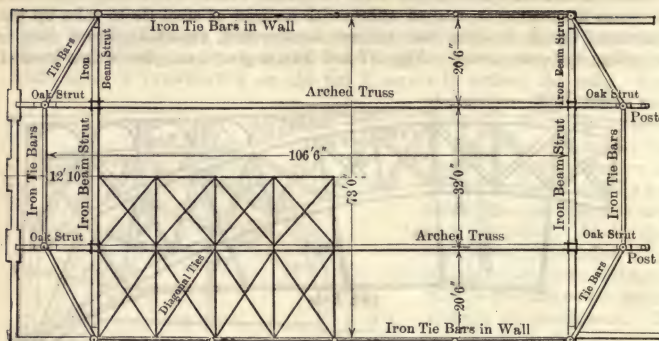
Plan of Truss-framing of Fifth Avenue Riding-school, New York City
